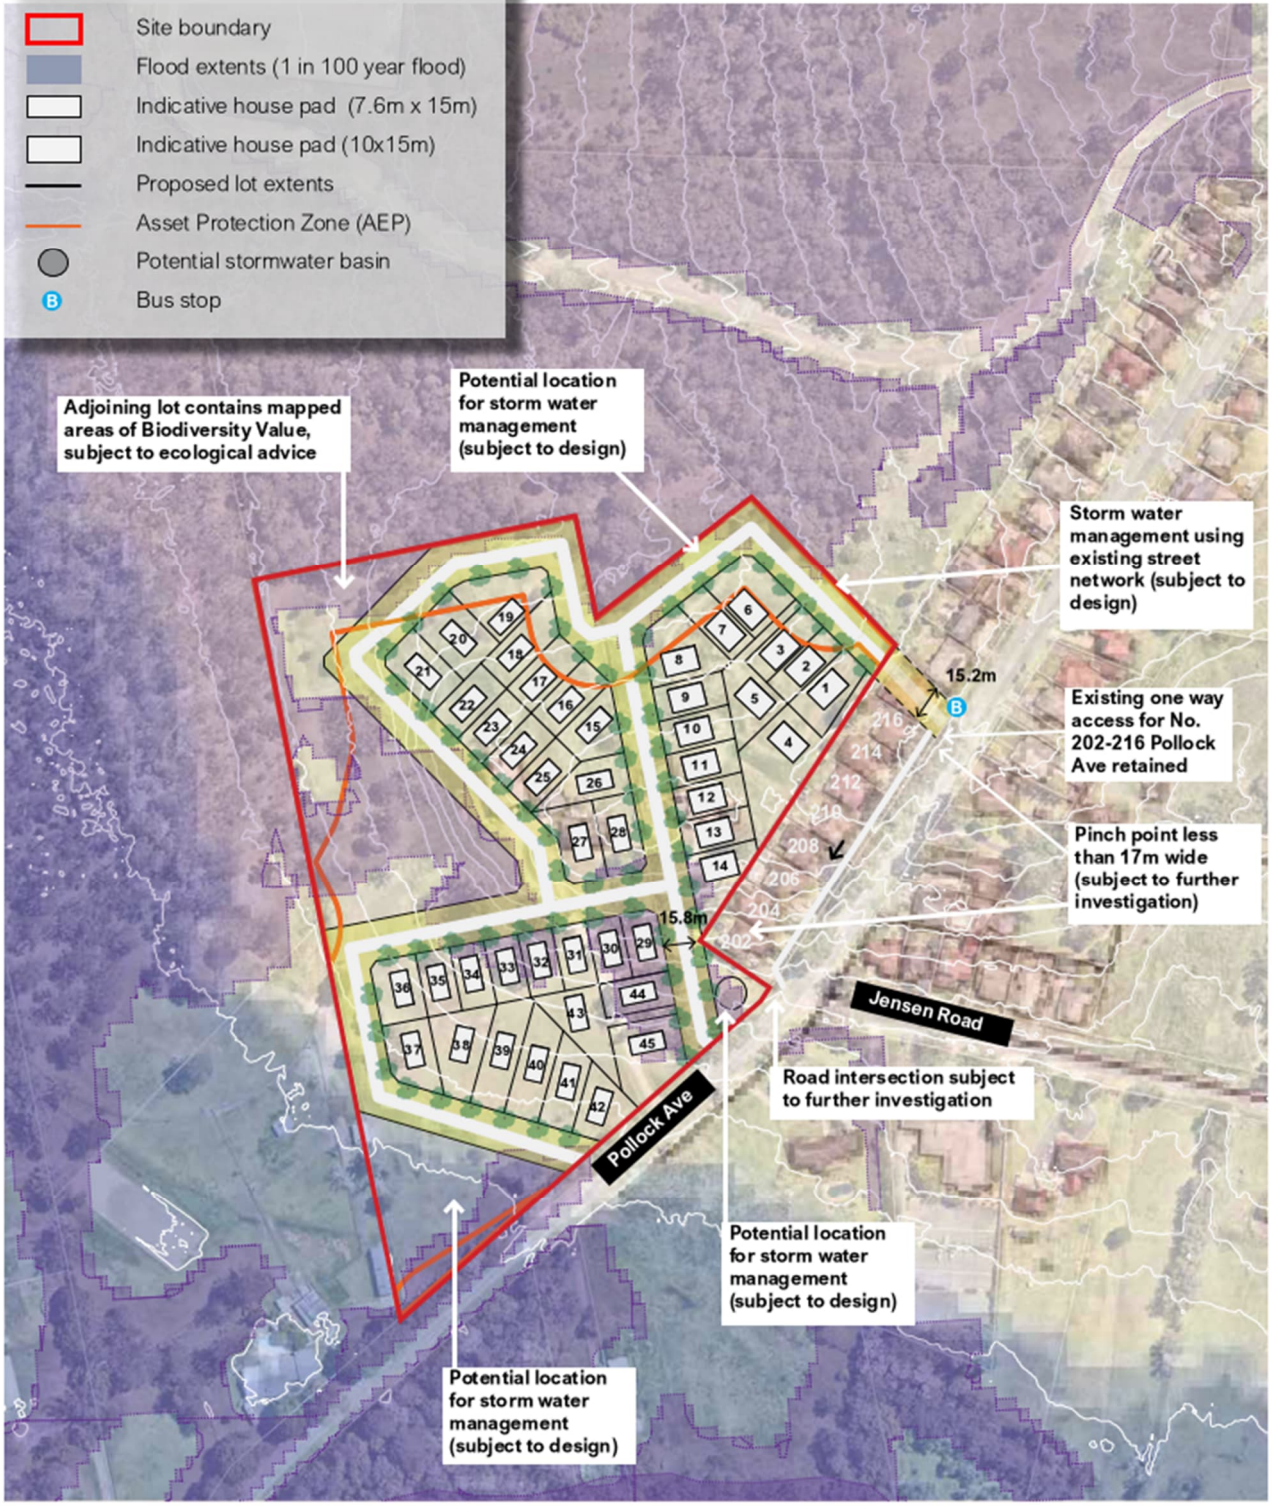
Concept plan for the site and potential overlay on the adjoining property at 188 Pollock Avenue
